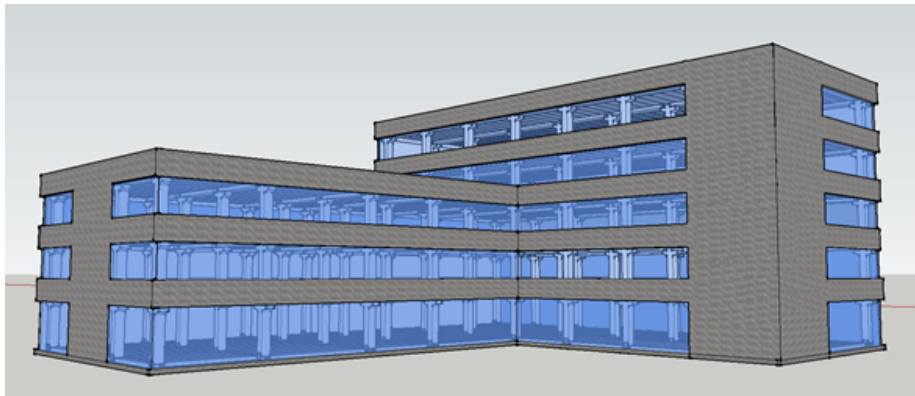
Placing the facade so that the building can be delivered to the client.
